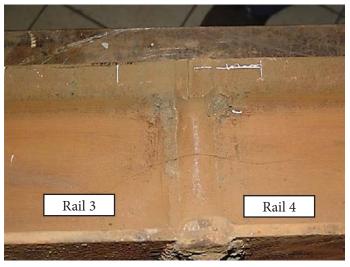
Fatigue crack in joint S2 of rail 3 and 4
